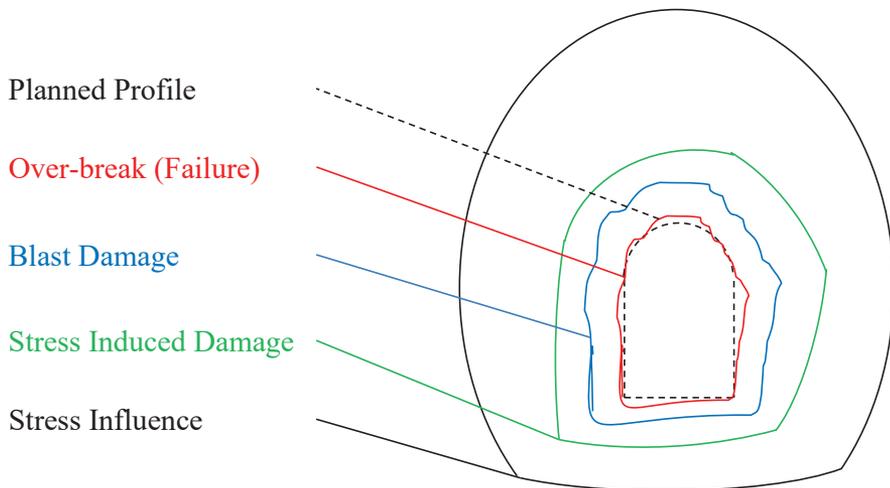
Excavation damage divided into subzones: over-break, blast damage, stress induced damage and stress influenced areas.
